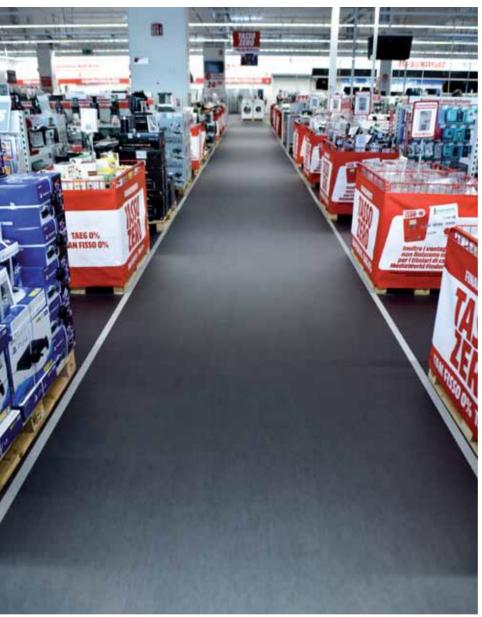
Before bonding the floor covering, TRIBLOCK P epoxycementitious primer was applied on the substrates
